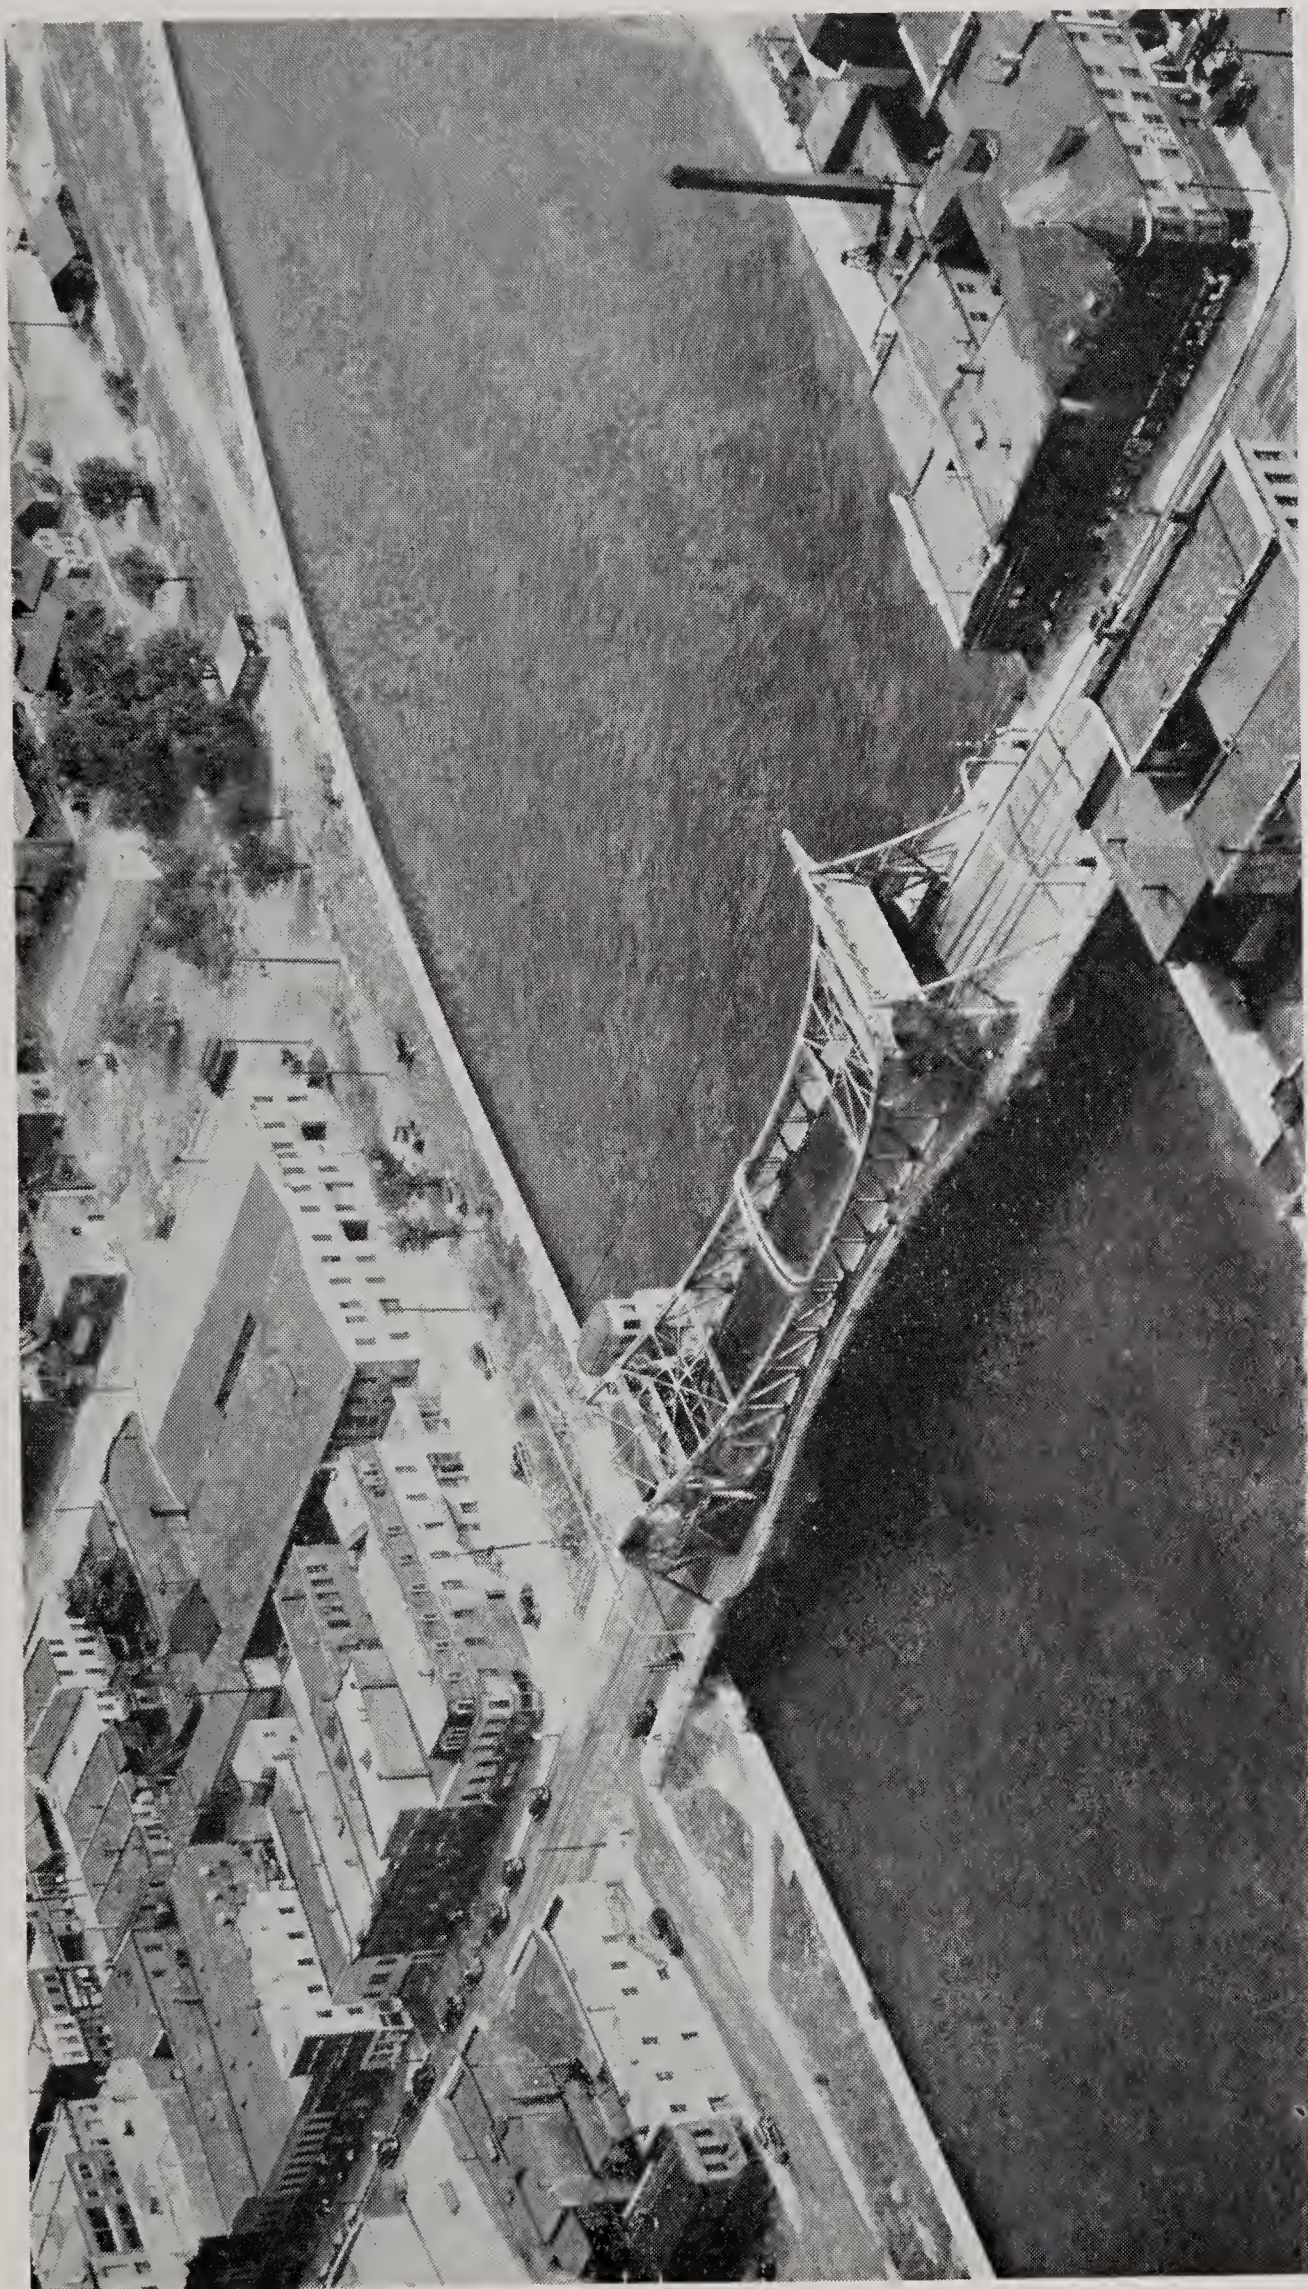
Aerial view of Jefferson Street Bridge looking south at Joliet.
